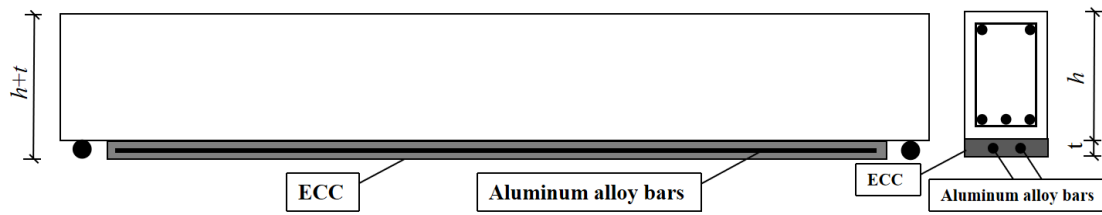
Aluminum reinforcement-ECC composite reinforced concrete beams
